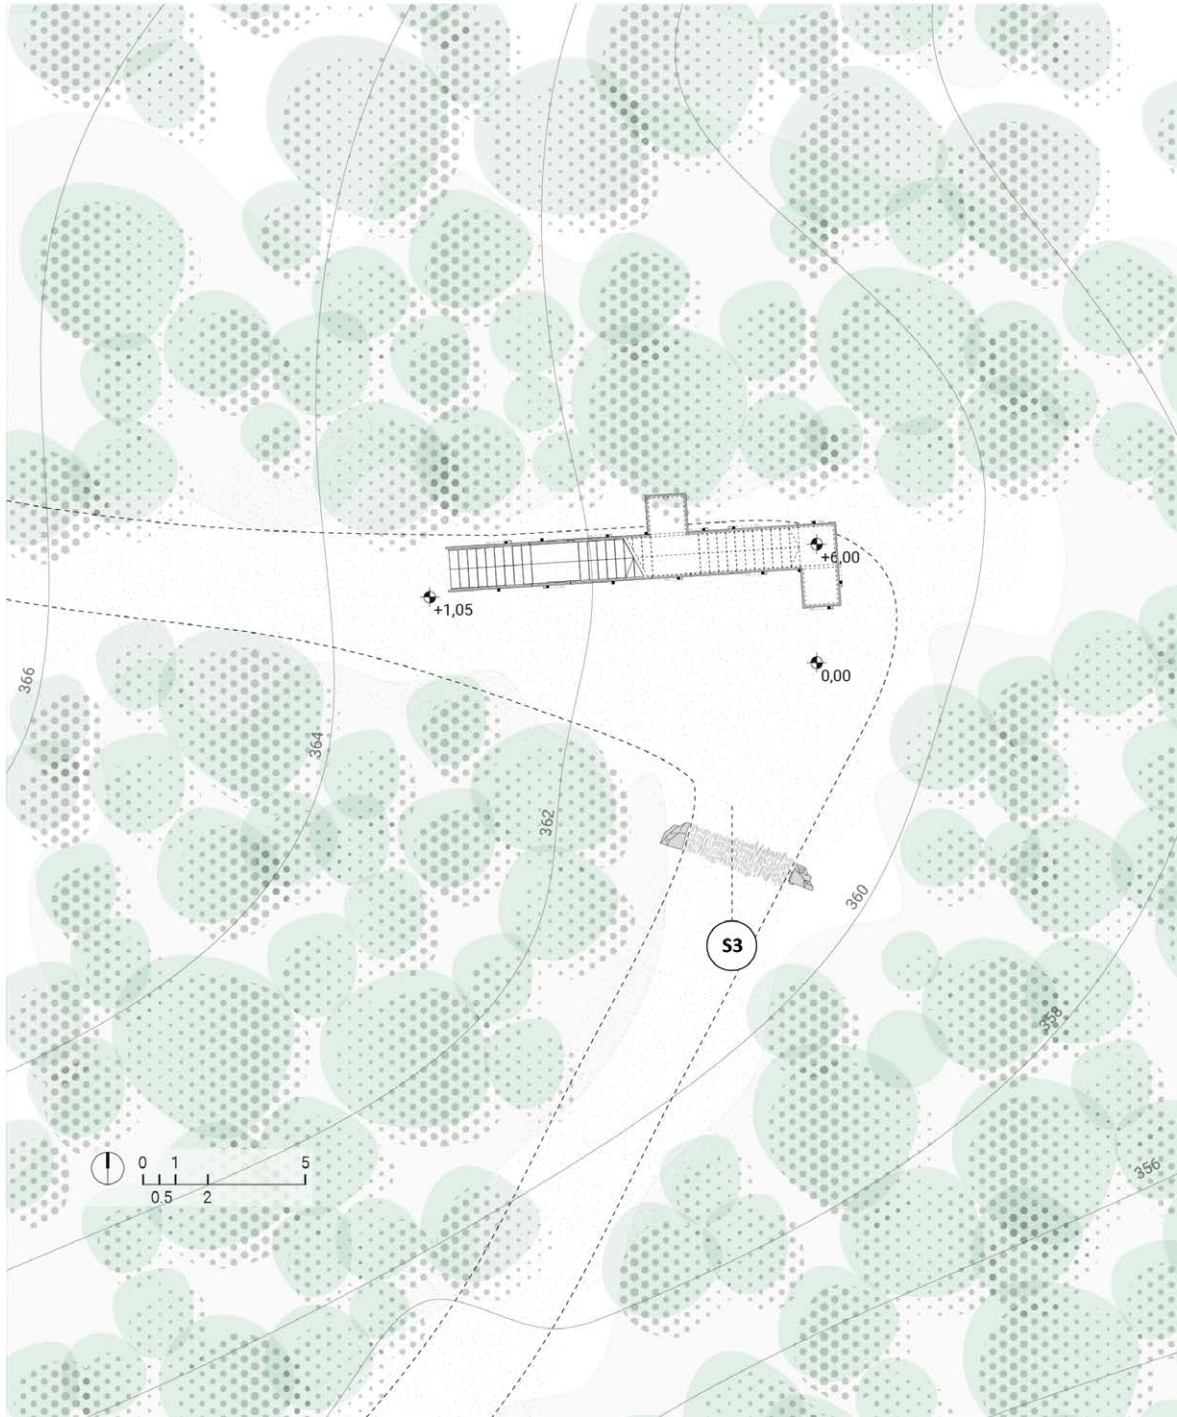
Panoramic Viewpoint. Technical plan.
